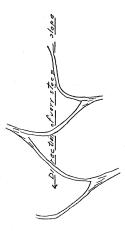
Schematic arrangement of switchbacks on a road slide.
